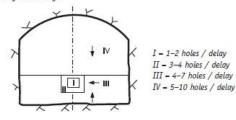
20. Holes are closely located so that the charge in each drill hole can be limited.
